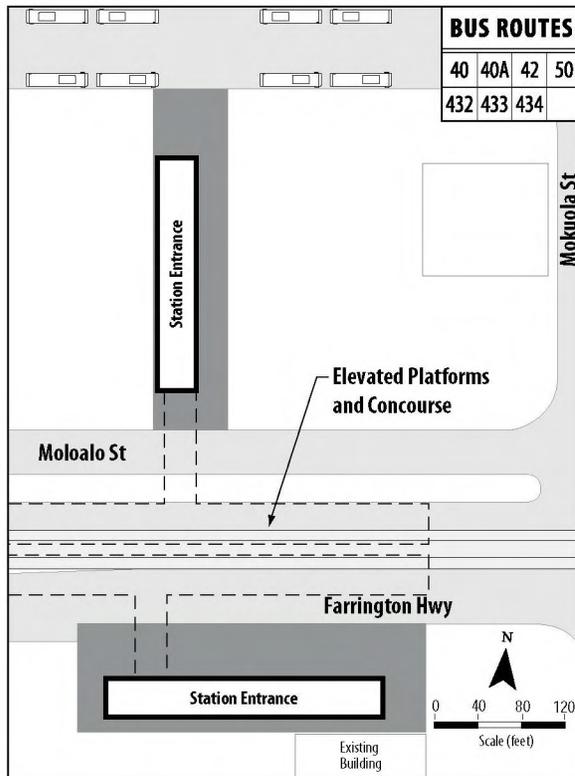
Waipahu Transit Center Station (All Build Alternatives)
